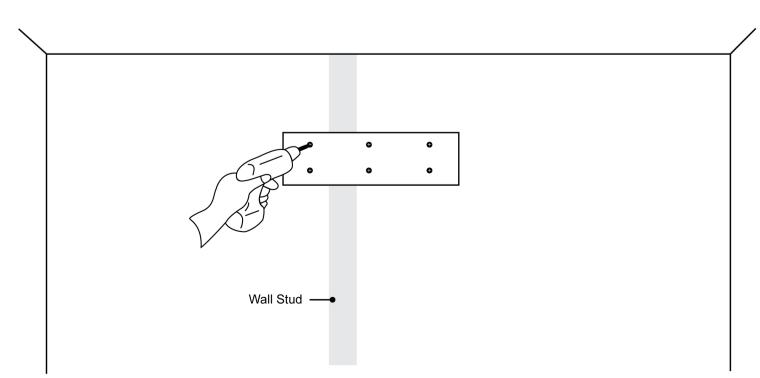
Remove the Fixing Rail and drill 5mm holes where you have marked with the screw.
